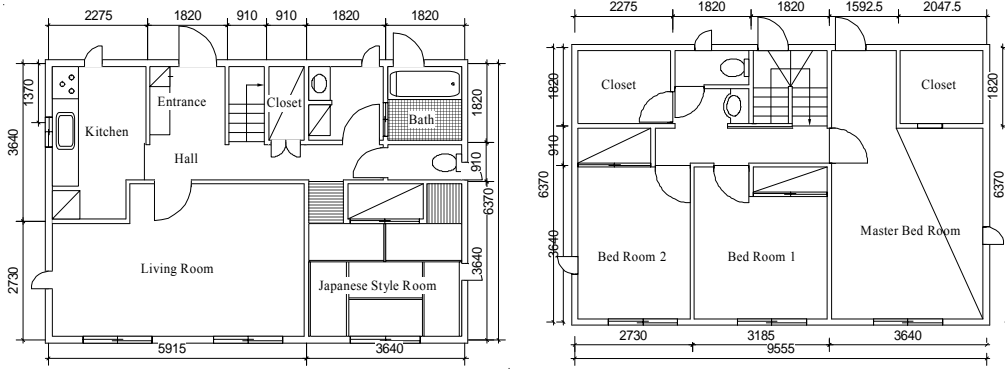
Floor Plan of the Subject House (Left: 1st Floor Plan, Right: 2nd Floor Plan)
